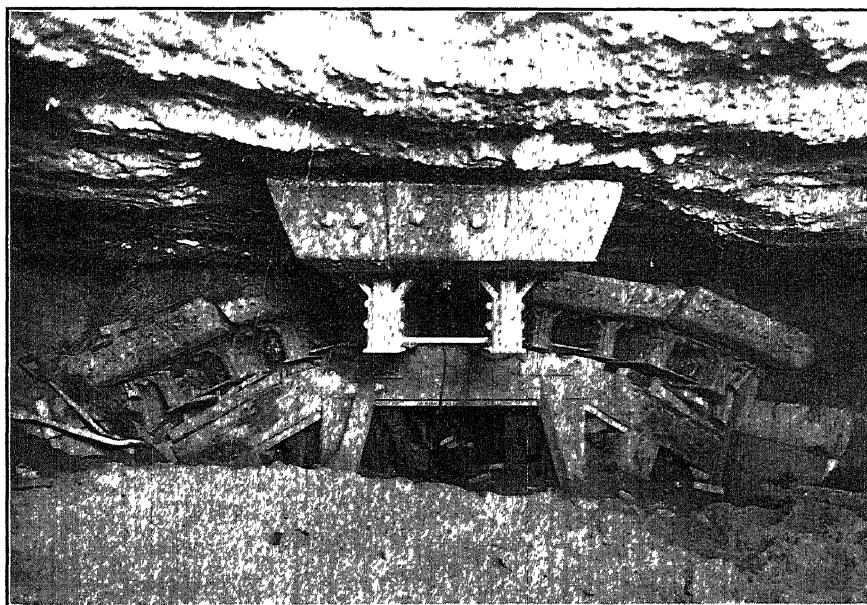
SECTIONAL SHIELD EMERGING INTO A SHAFT.
